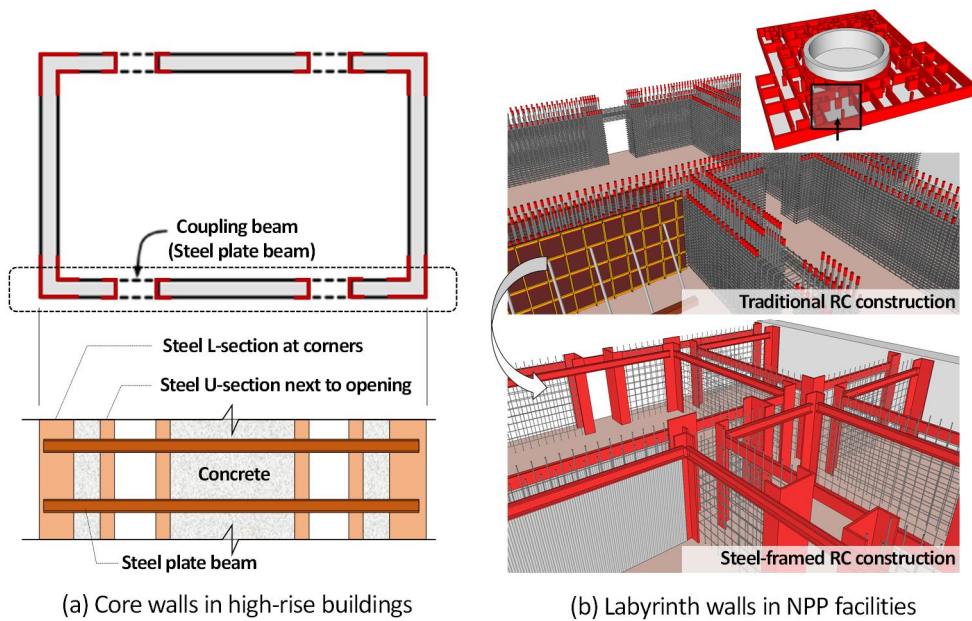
Potential use of SUB-C walls to high-rise buildings and NPPs.
